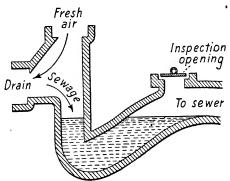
BUCHAN'S DISCONNECTING AND VENTILATING TRAP.
